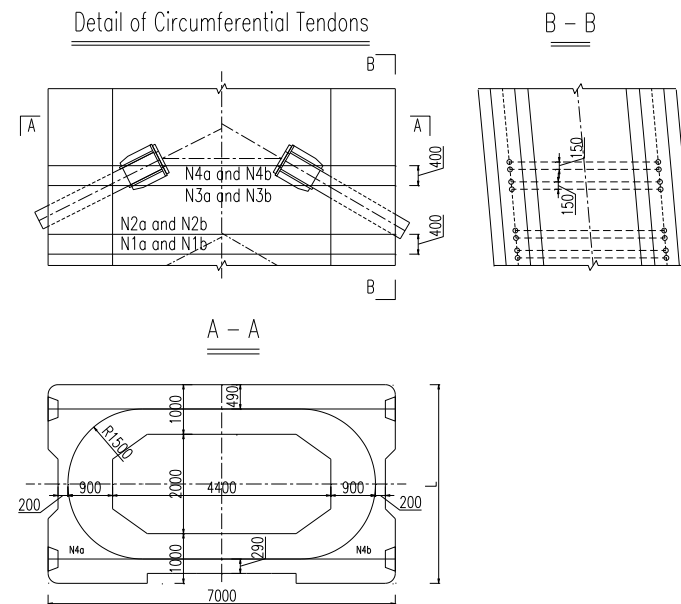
Arrangement detail of circumferential prestressing of the Huaizhou Tuojiang Bridge (Unit: mm)
